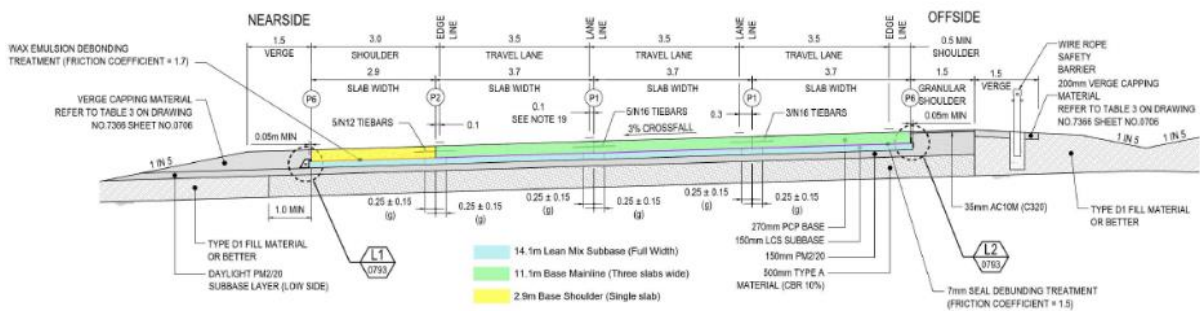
(b) 3-lane carriageway showing base paving runs (Northern Connector Adelaide)
